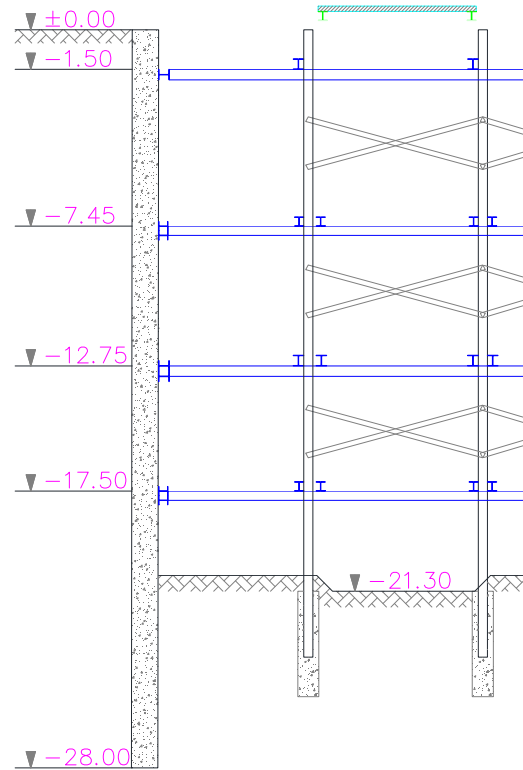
Detail of temporary bracing system Rosewood Hotel.
